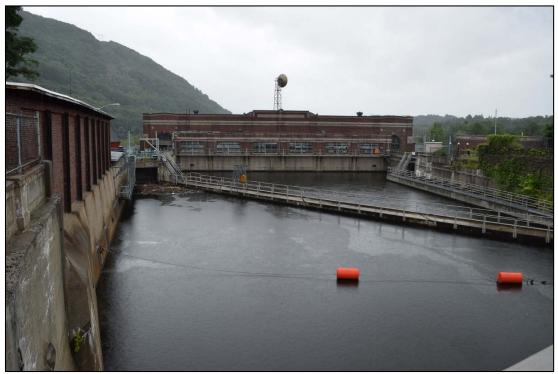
Bellows Falls Project, forebay of Canal and Powerhouse headworks building, looking south.
